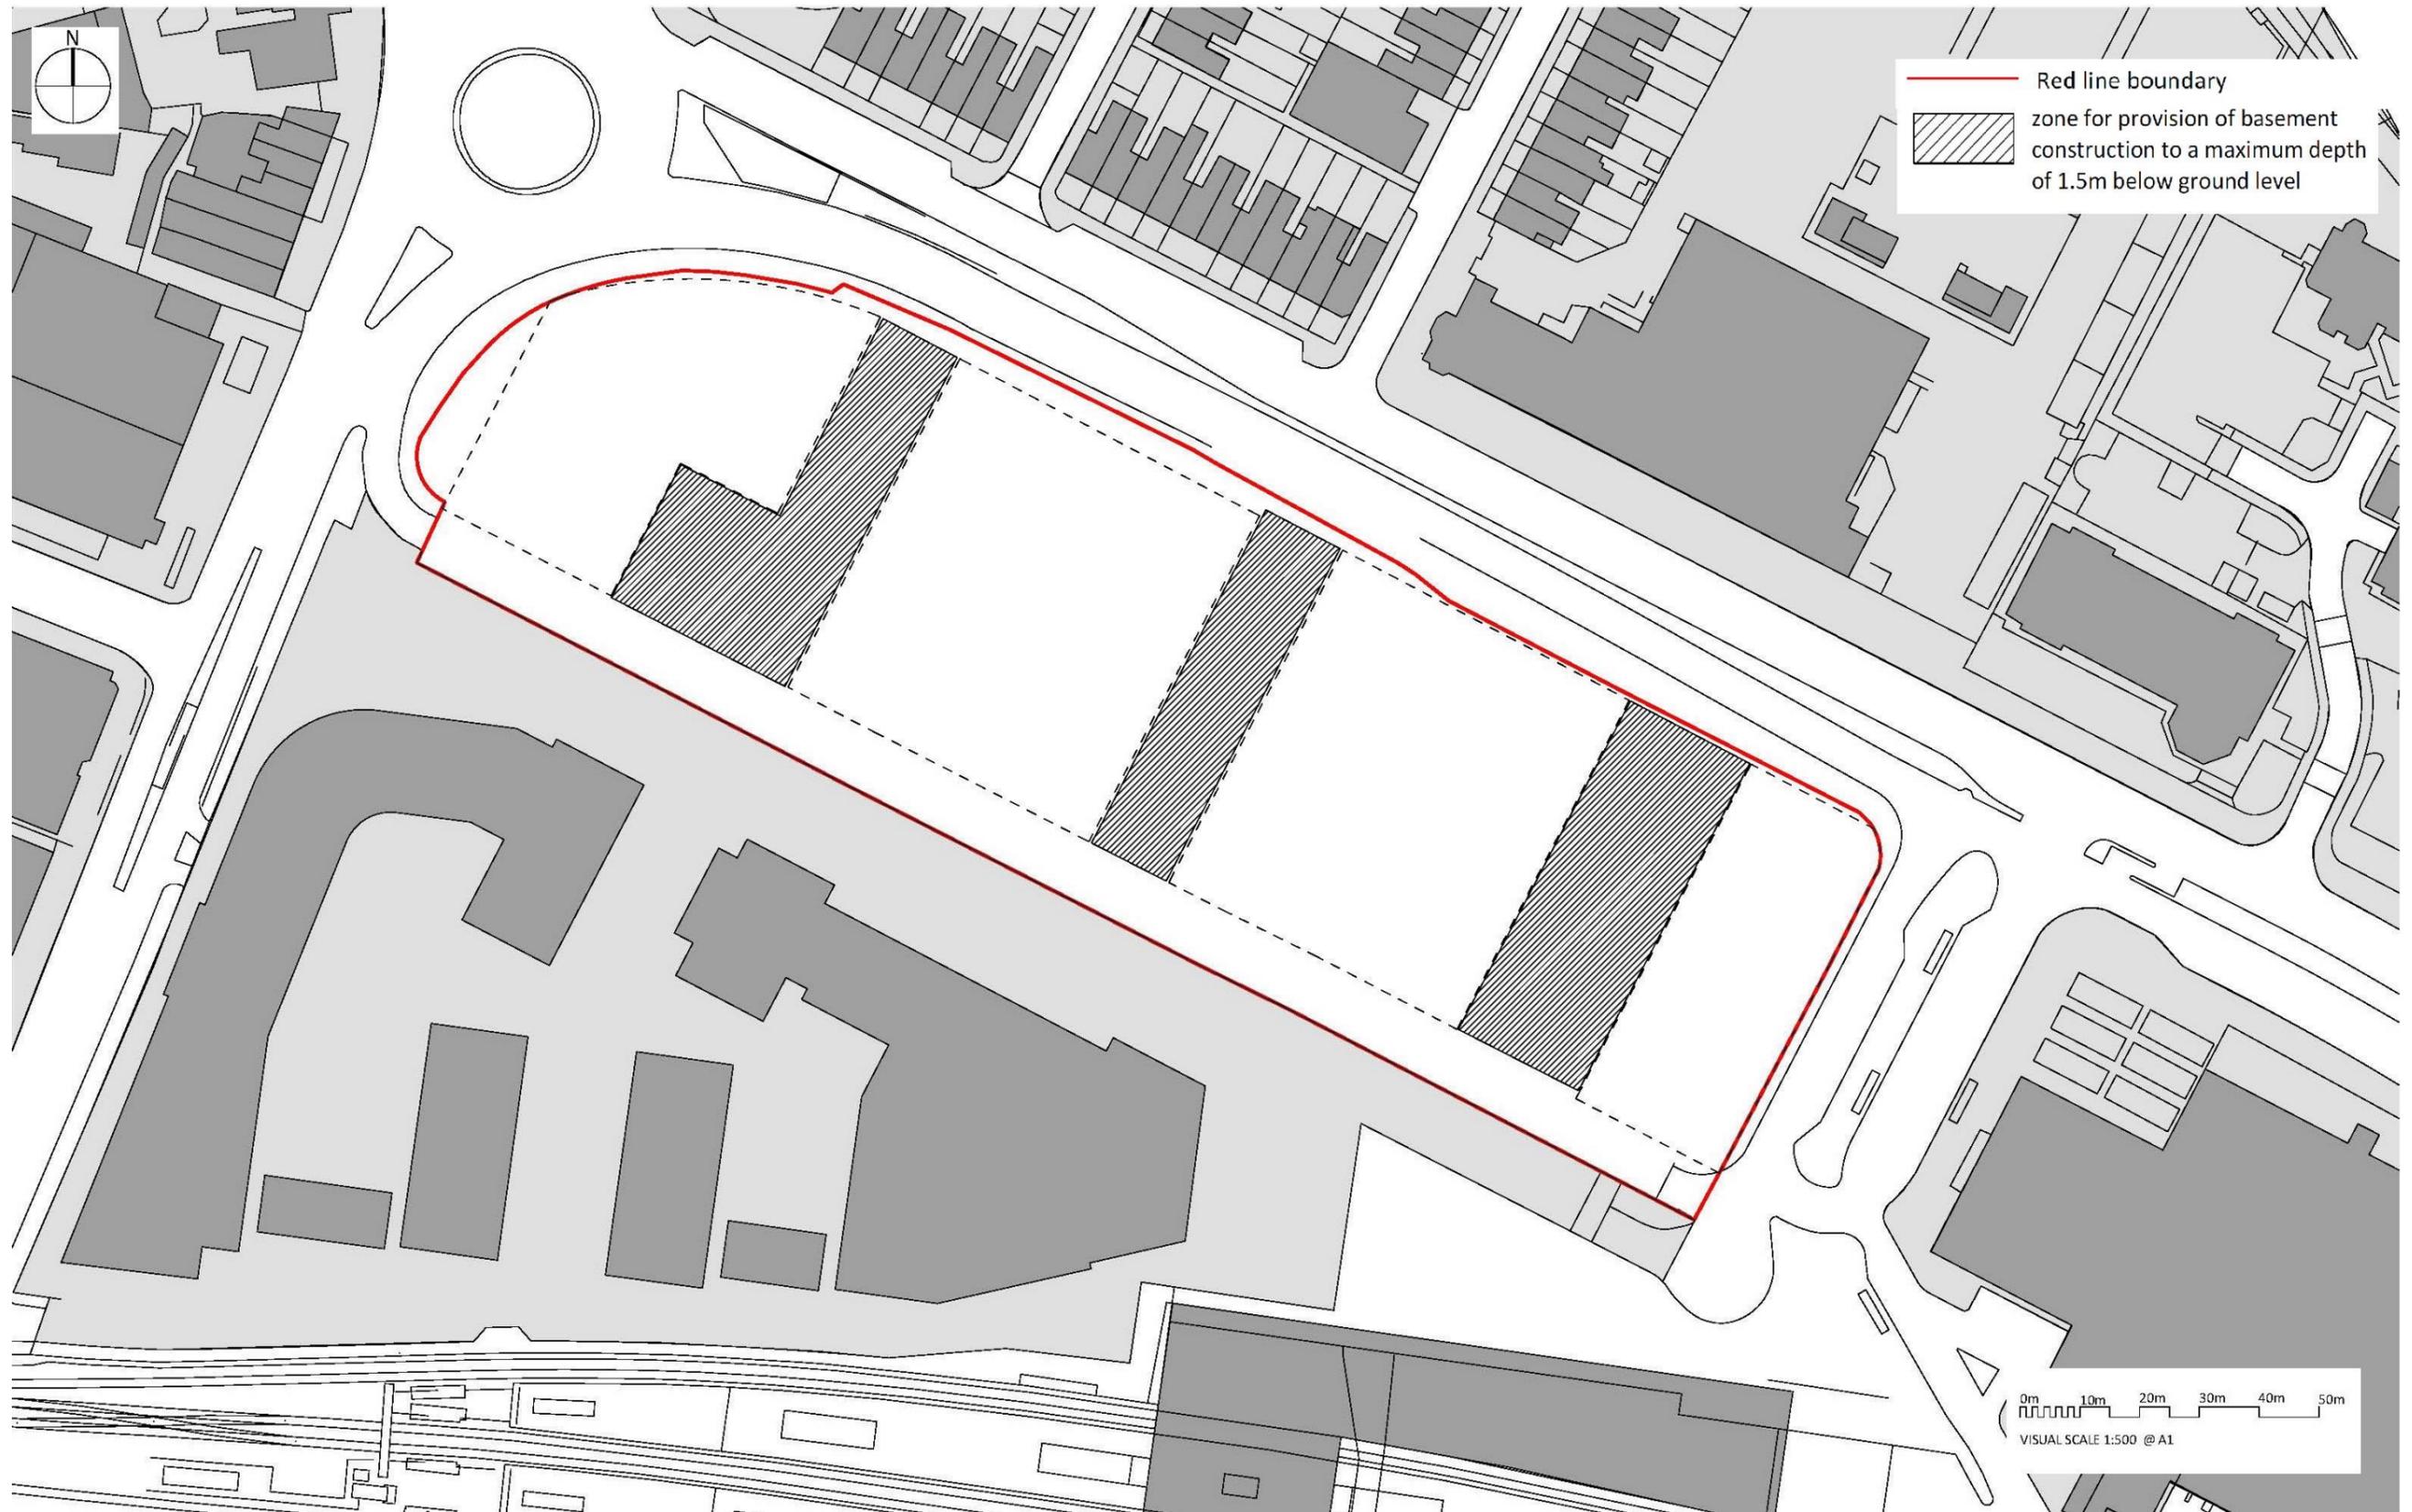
Parameter Plan 106 - Excavation Zone for Below Ground Attenuation
